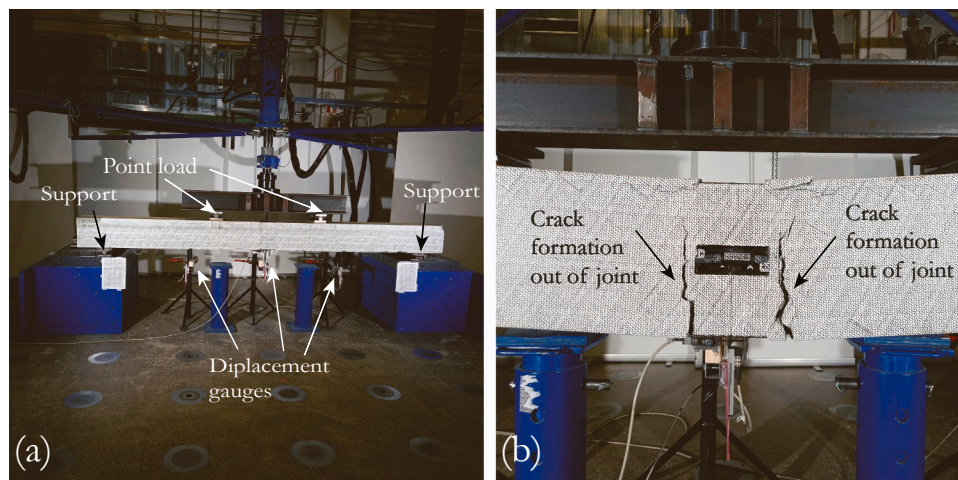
The bending test setup, (a) loading, (b) failure outside the joint.
